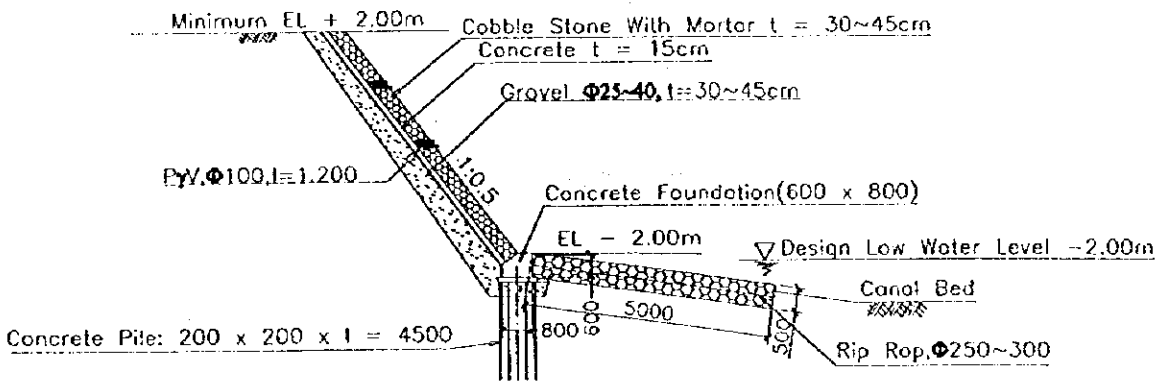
(5/5) PROPOSED CROSS SECTION OF TAU HU - BEN NGHE CANAL
